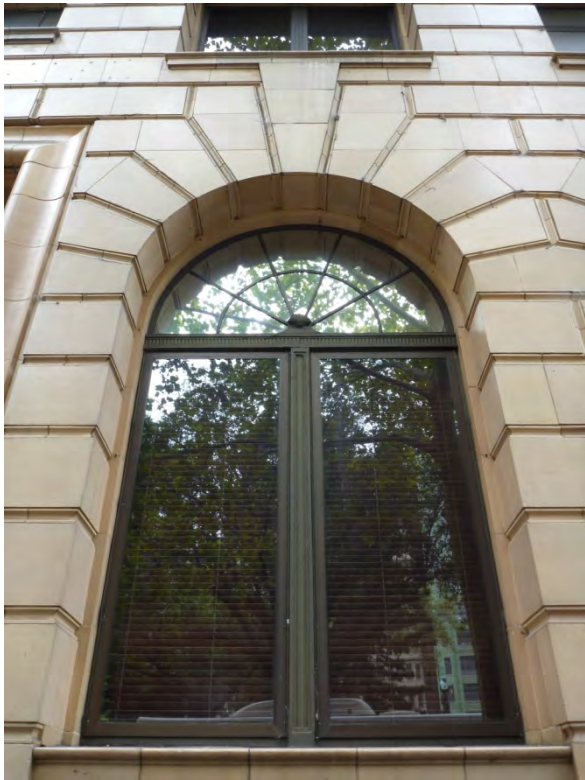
Original windows and glazed terracotta cladding, Carrington Street facade of the former Shell House. (Source: GML 2014)
